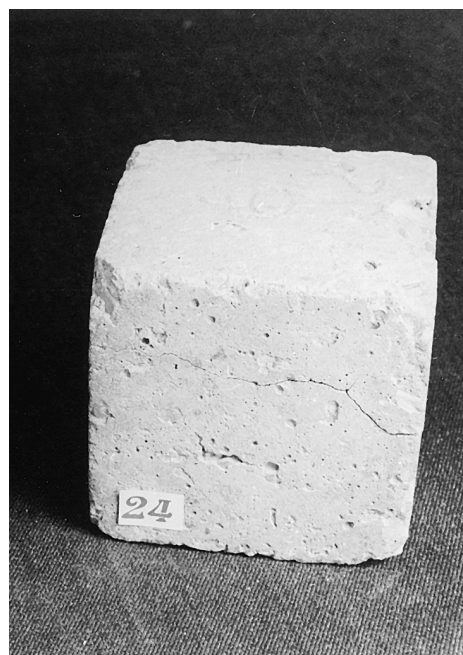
Concrete cube having uncoated MS rebars (45 cycles).
